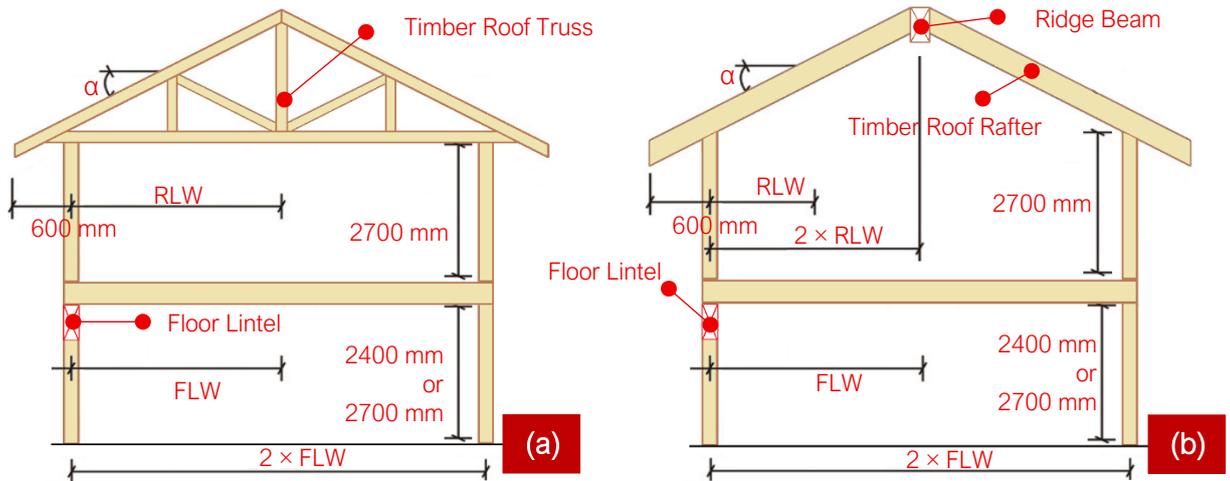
Red Stag Vertex₂₀ floor lintel beam; a) Timber roof truss, b) Timber roof rafter.
